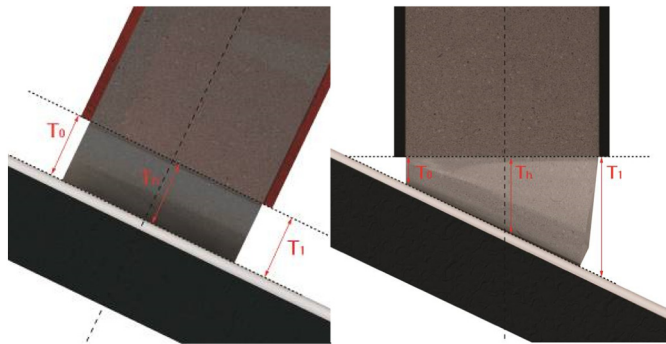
[Left] showing constant nozzle offset printing perpendicular to surface. [Right] Variation in nozzle height when printing perpendicular to a horizontal axis.
